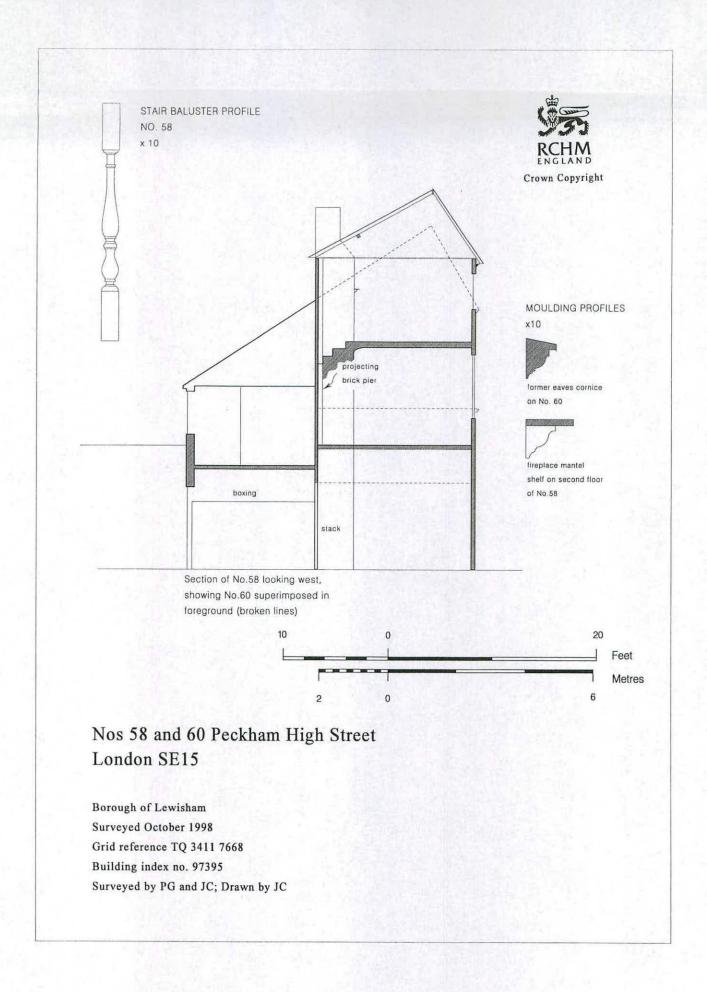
Nos 58 and 60 Peckham High Street, section looking west with stair baluster and moulding profile details.
